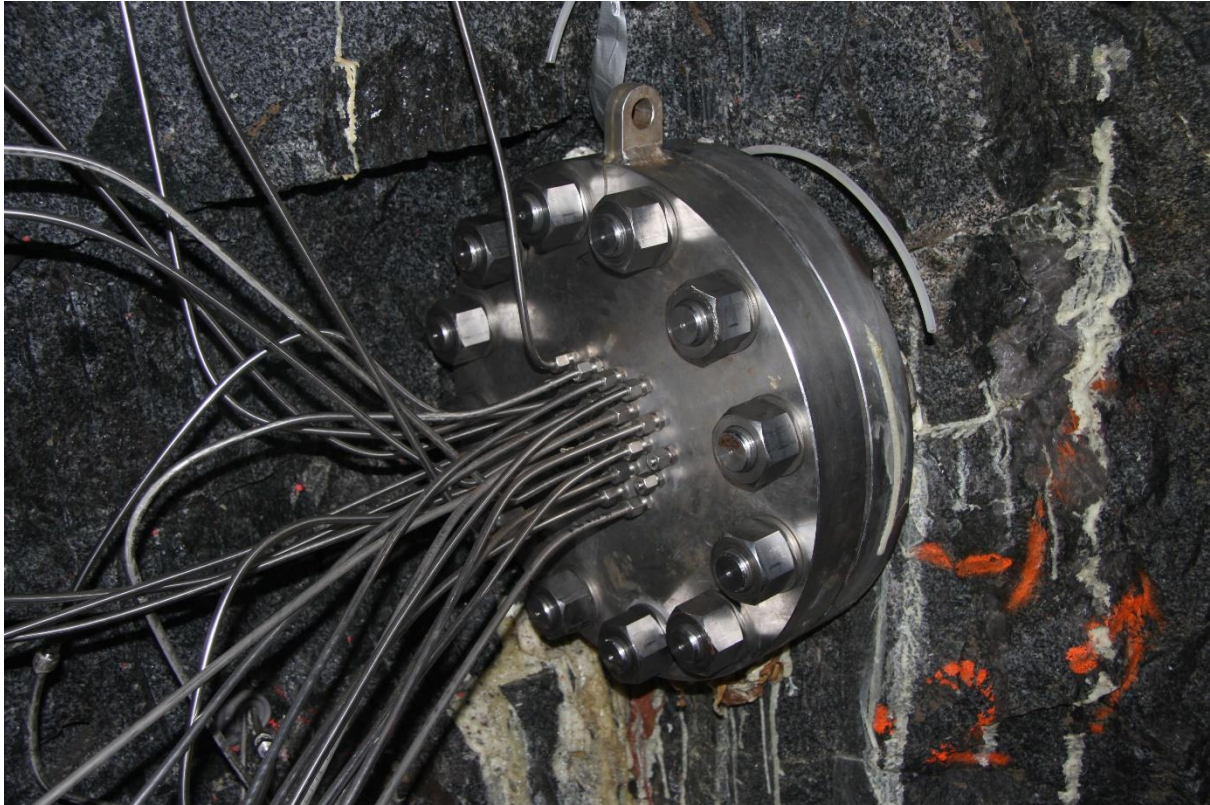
Installed cable head with attached sensors (1 September 2014)
